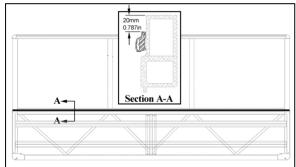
FACE FIXED WINDOWS - RUBBER SEAL INSTALLATION
